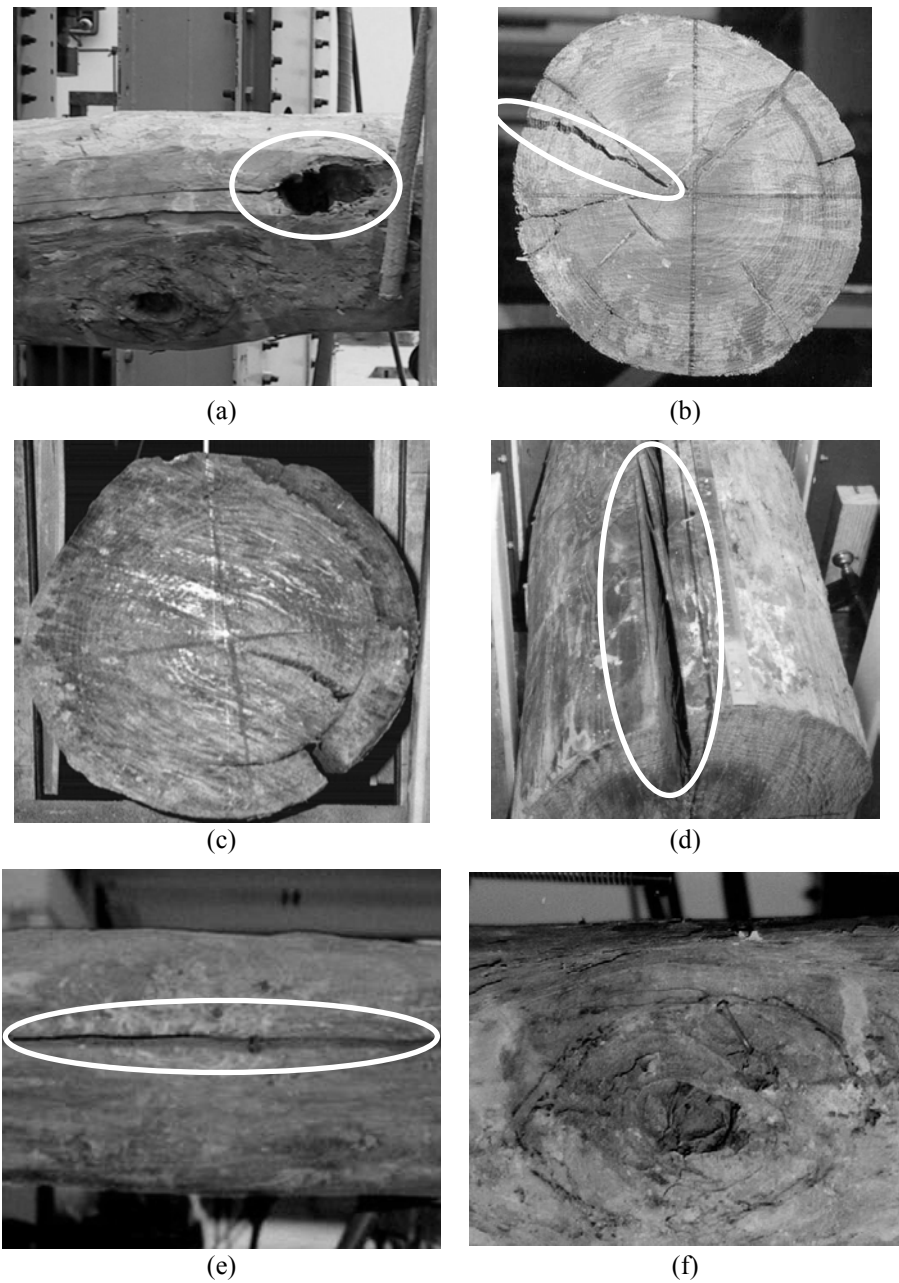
Typical defects of tested specimens: degraded zones and holes (a,f), transversal cracking (b, c), longitudinal splitting starting from end-beam (d, e).
